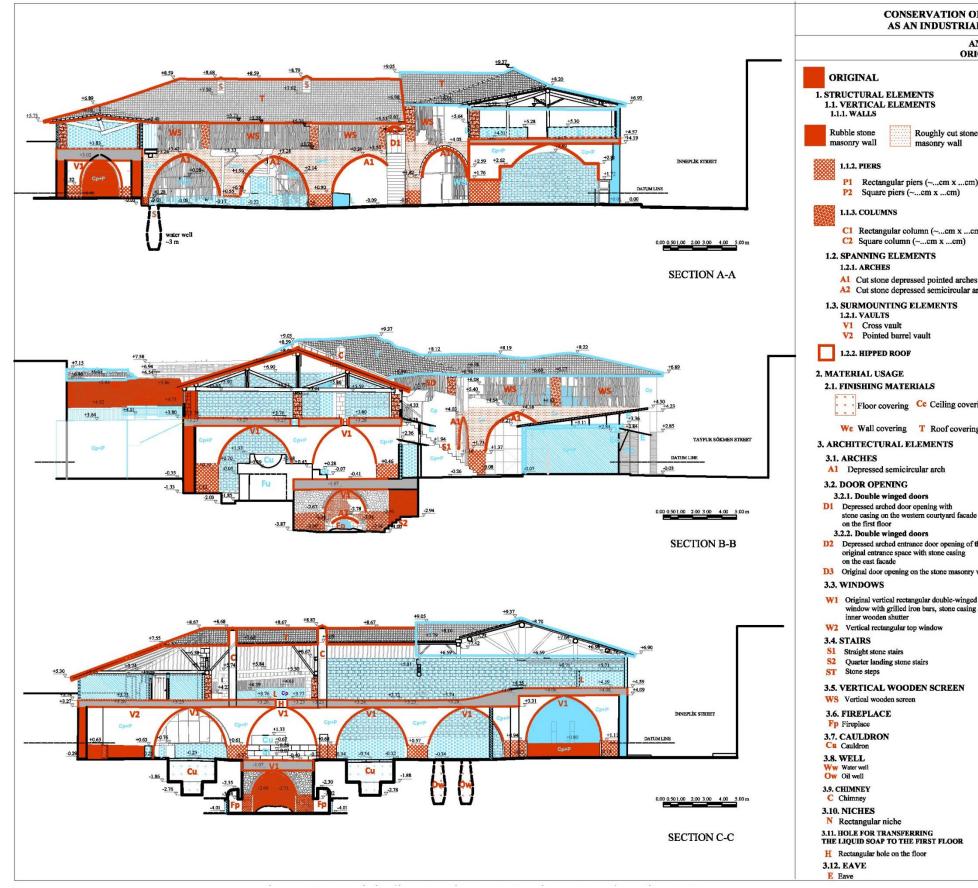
Originality – Section A-A, Section B-B and Section C-C
